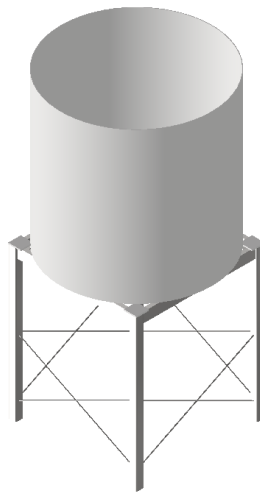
WATER TANK FRAME ASSEMBLY
